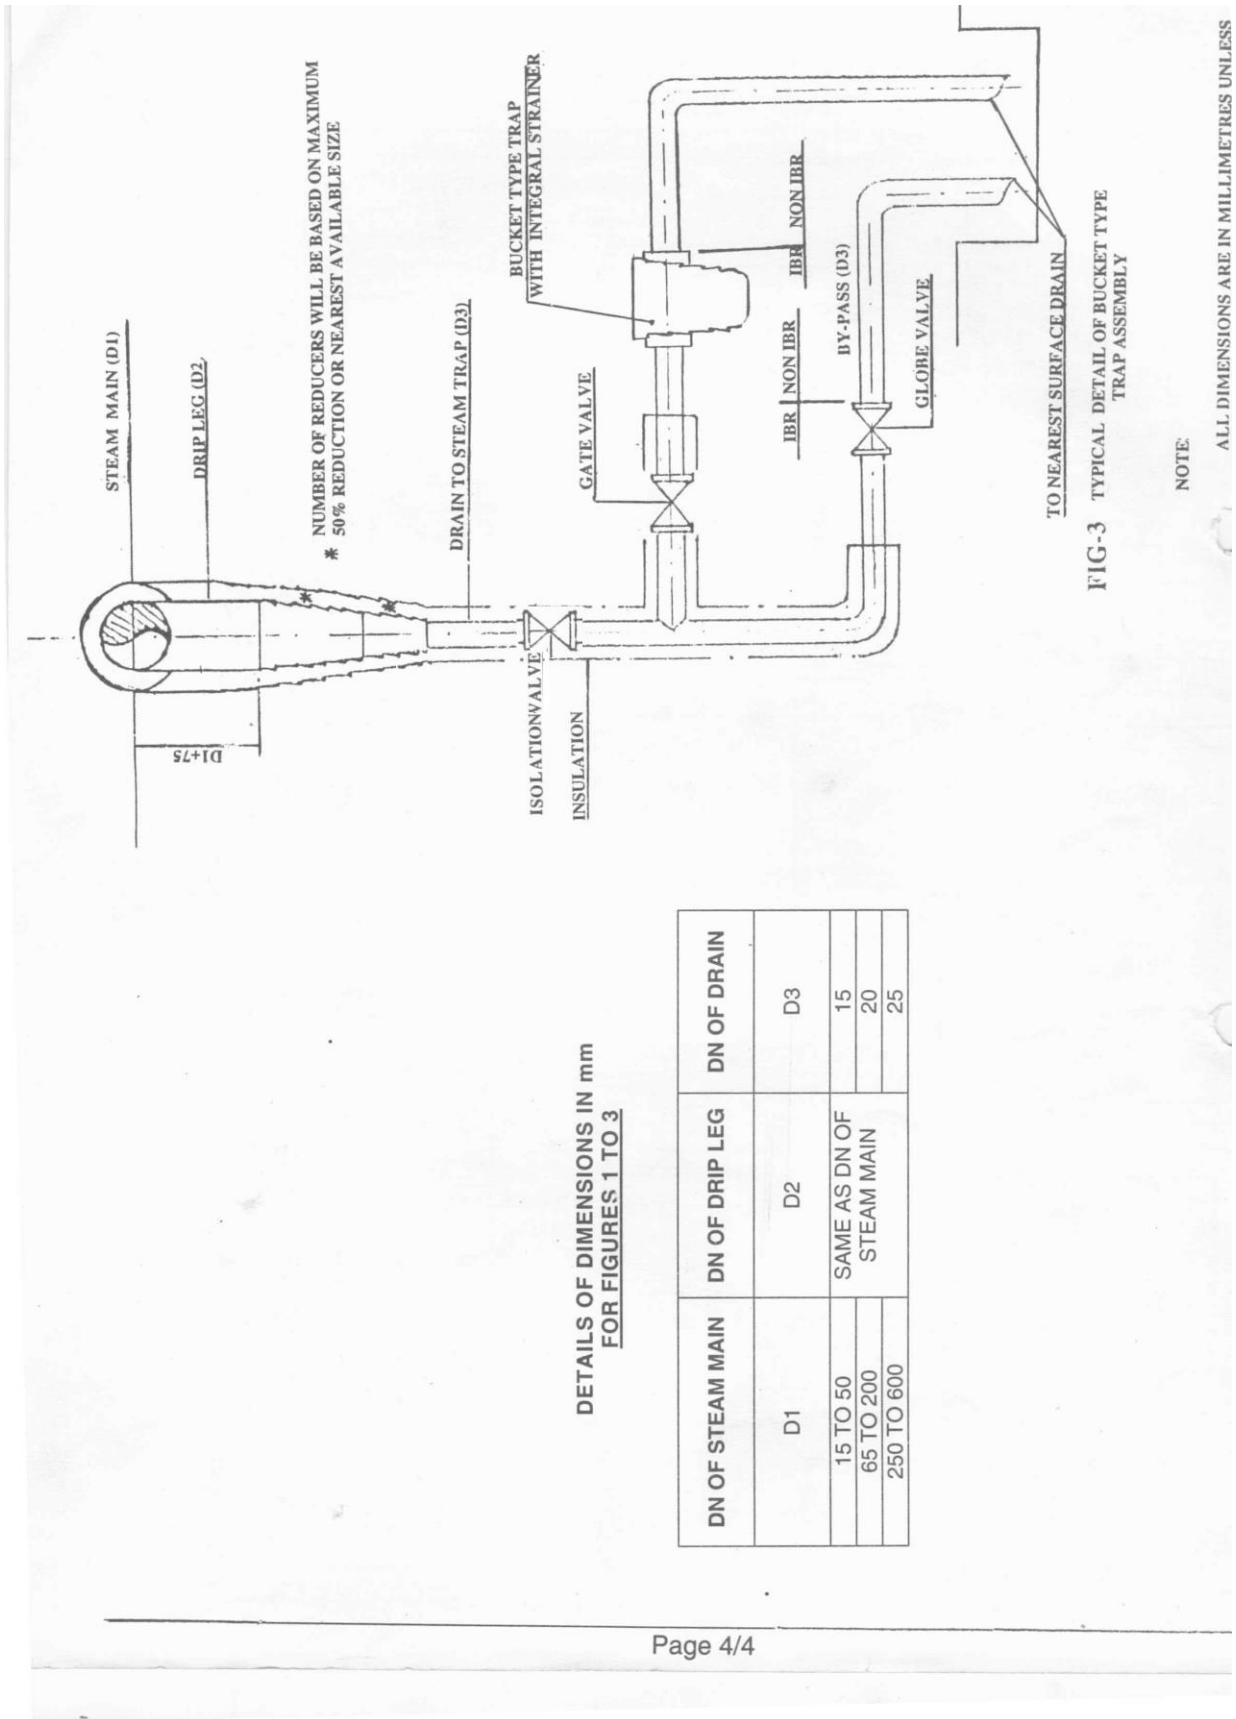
TYPICAL DETAIL OF BUCKET TYPE TRAP ASSEMBLY
